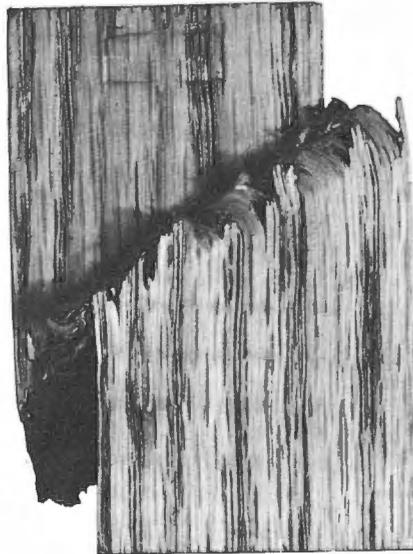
Oak block bearing a strong shear; the deforming pressure was continued for a considerable period after failure.
